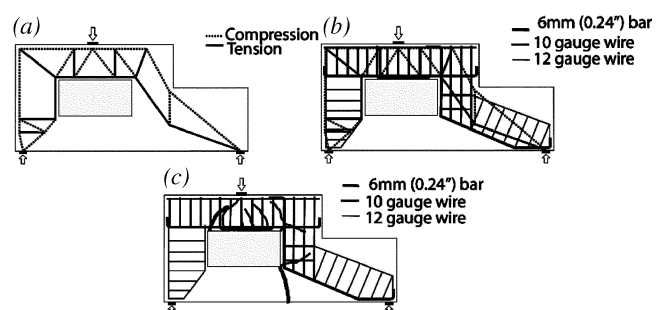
Specimen 3: (a) STM; (b) reinforcing layout superimposed on STM; (c) crack pattern at failure superimposed on reinforcing layout.
